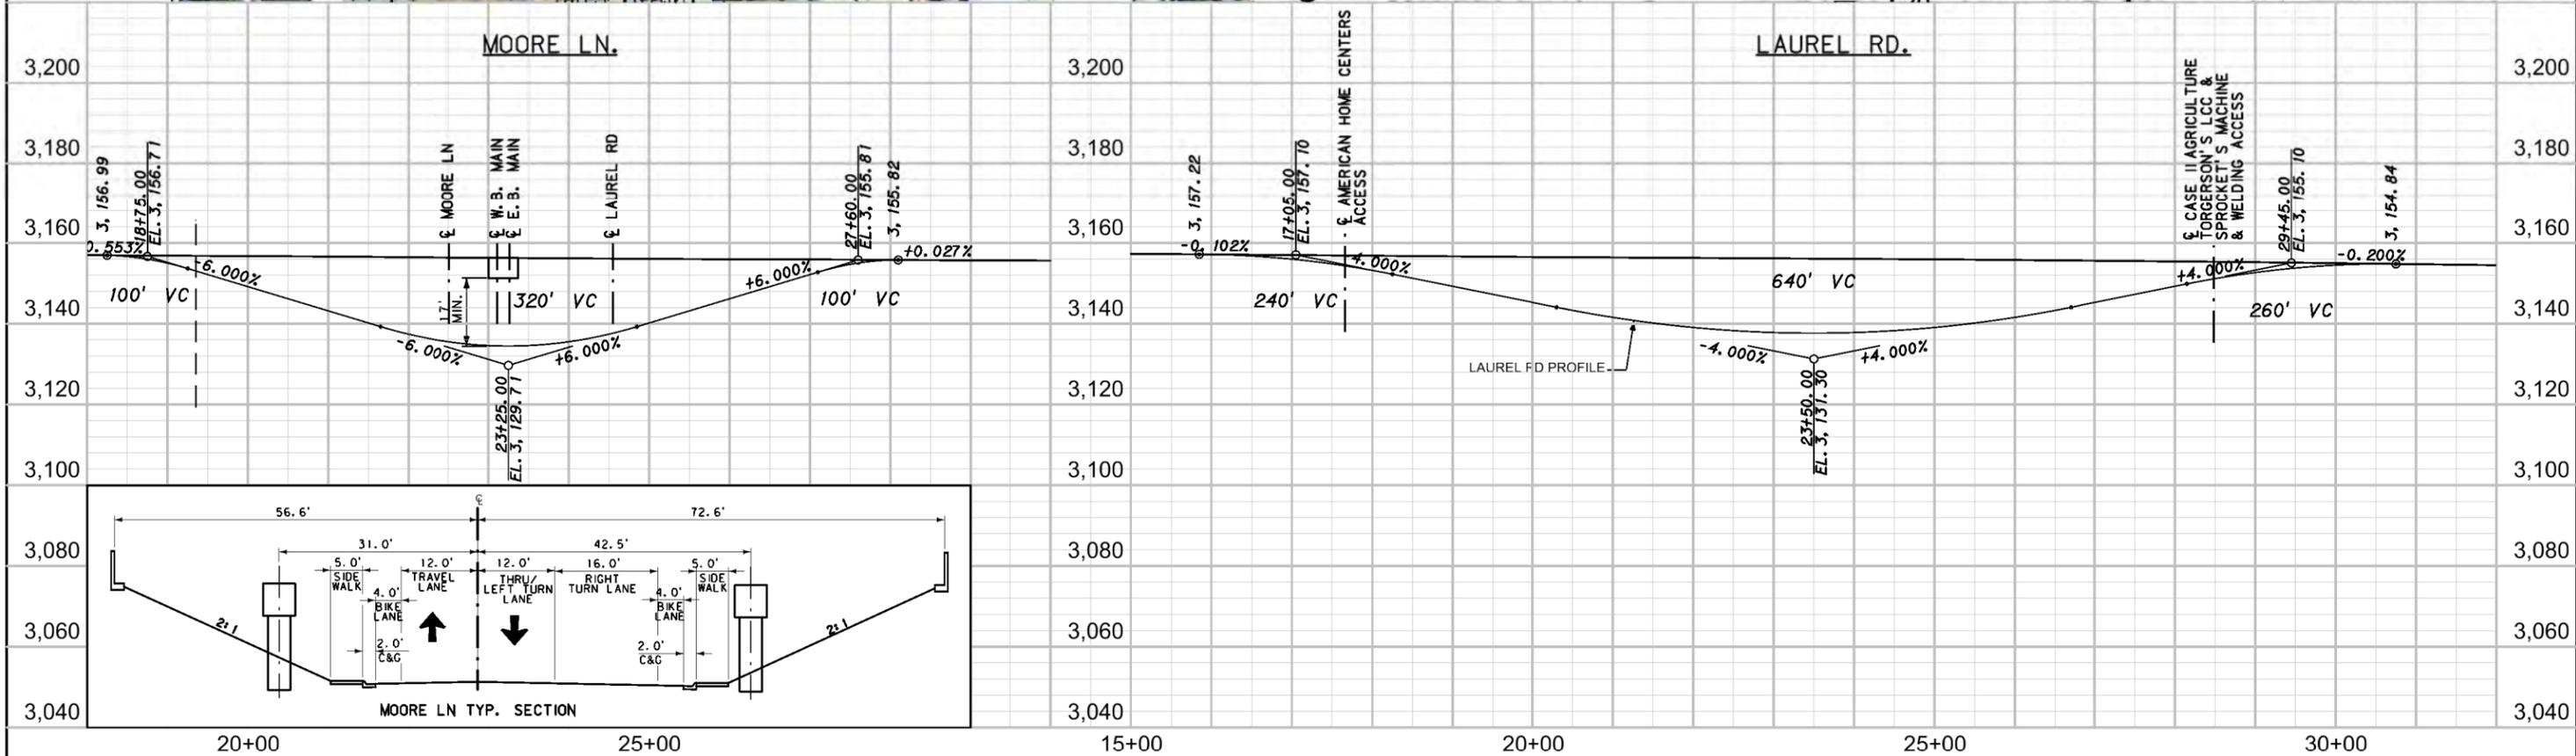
Moore Lane Underpass Conceptual Plan and Profile
